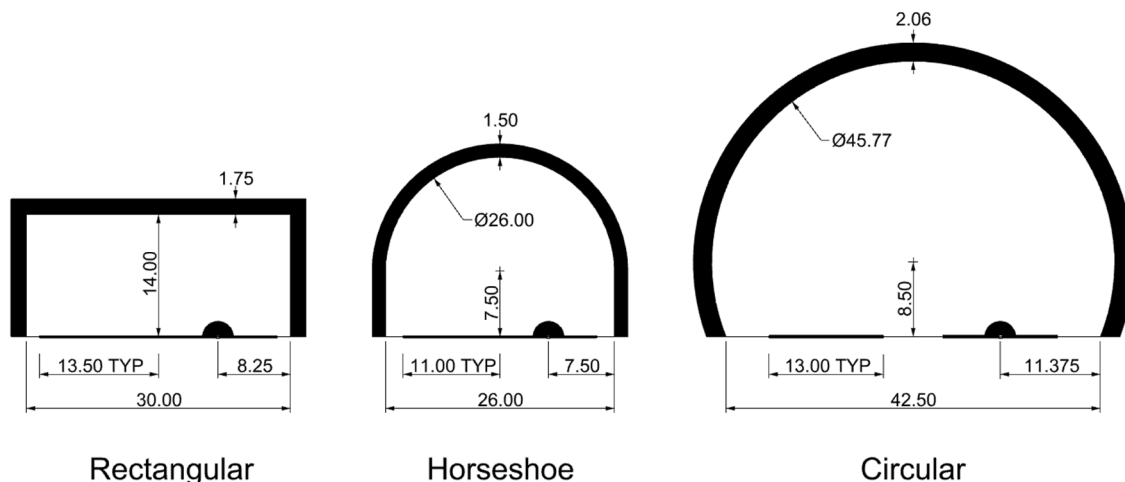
Tunnel geometries and details (all dimensions in feet = 0.3048 m)
